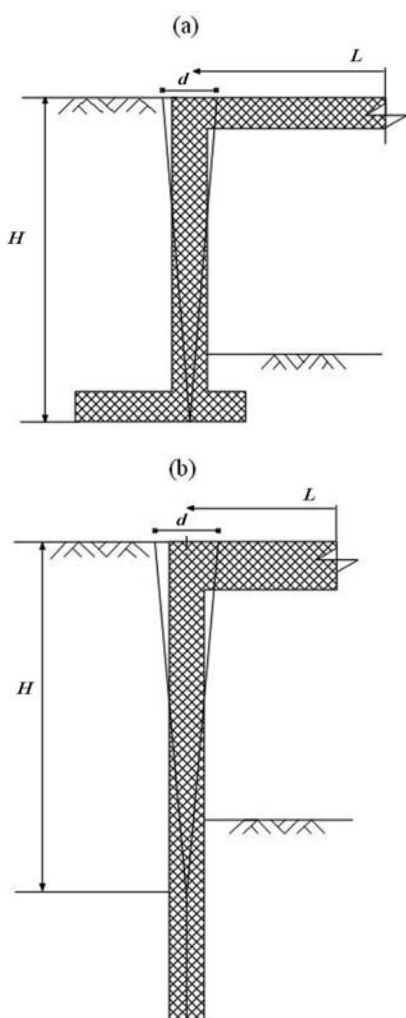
Imposed cyclic movement of the bridge deck to the retaining wall.
